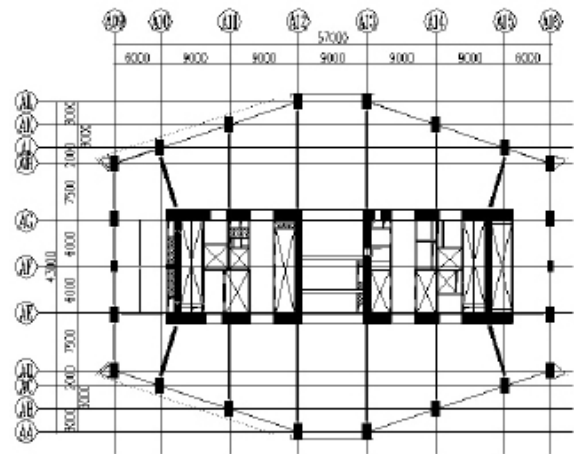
Plan of the strengthened floor (Source: Fujiang Xu)
